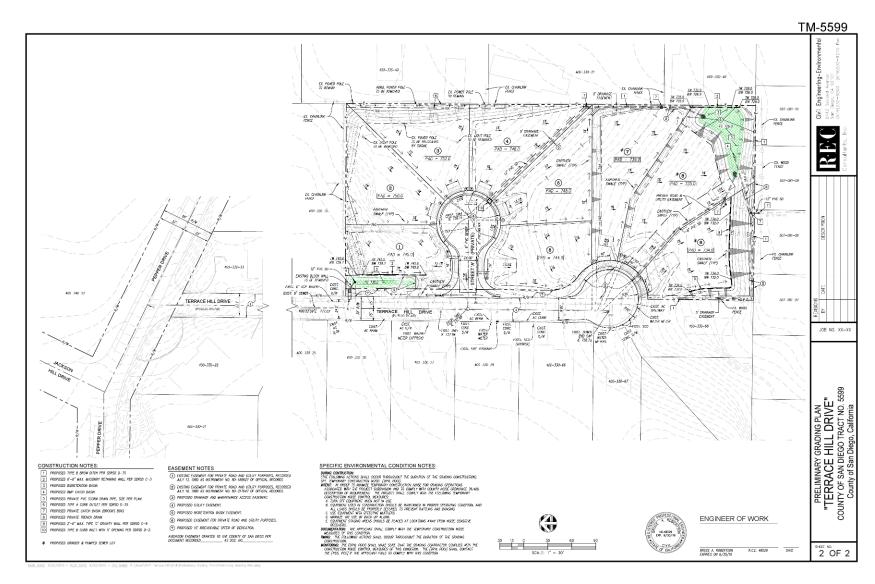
"Terrace Hill Drive" preliminary grading plan.
